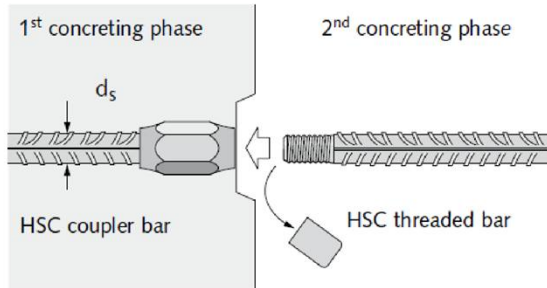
Installation principle for mechanical splice of reinforcing steel bars
